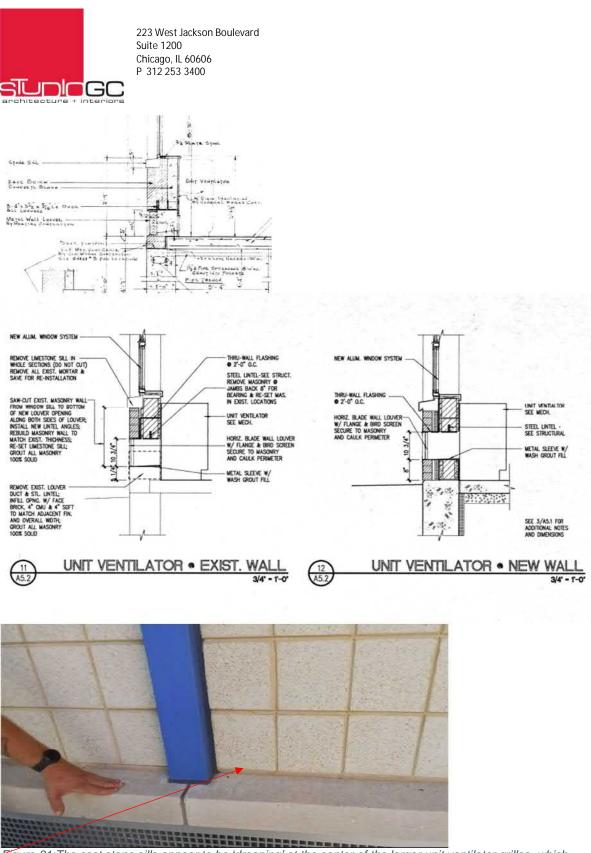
The cast stone sills appear to be 'drooping' at the center of the larger unit ventilator grilles, which is cracking the mortar between the wall and Smooth face CMU window infill. The 1955 and 1993 details show steel lintels for the smaller grilles, but none were found for the larger grilles. Further investigation is required.
